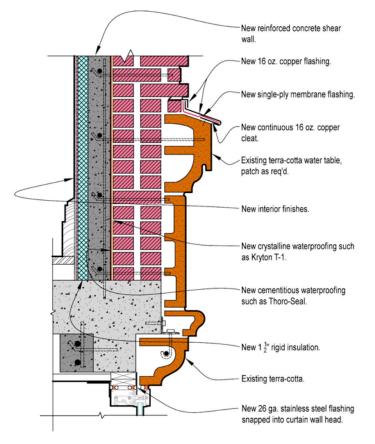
Opt. 3 "Steel Reconstruction Approach" at Floor-Line Through-Wall Flashings
